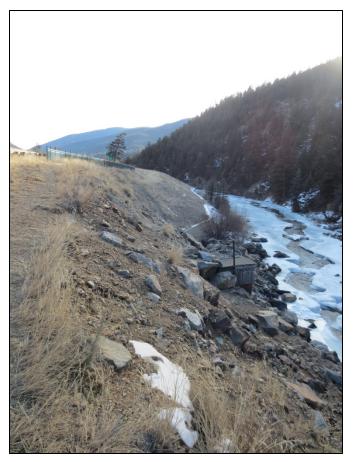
Big Five Mine, South of Interstate 70, (HDR, 2013). View to East of Lower Bench of North Side Waste Pile, with Possible Switch, and Retaining Wall. Green Fence at Top of Slope is Pedestrian Path, and Retaining Wall Visible in Background.
